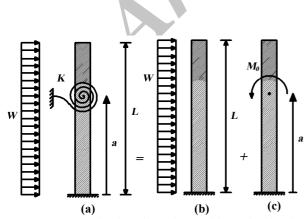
(a) Restrained cantilever beam with rotational spring under uniformly distributed loading, (b) cantilever beam under uniformly distributed loading and (c) cantilever beam with concentrated moment at spring location
